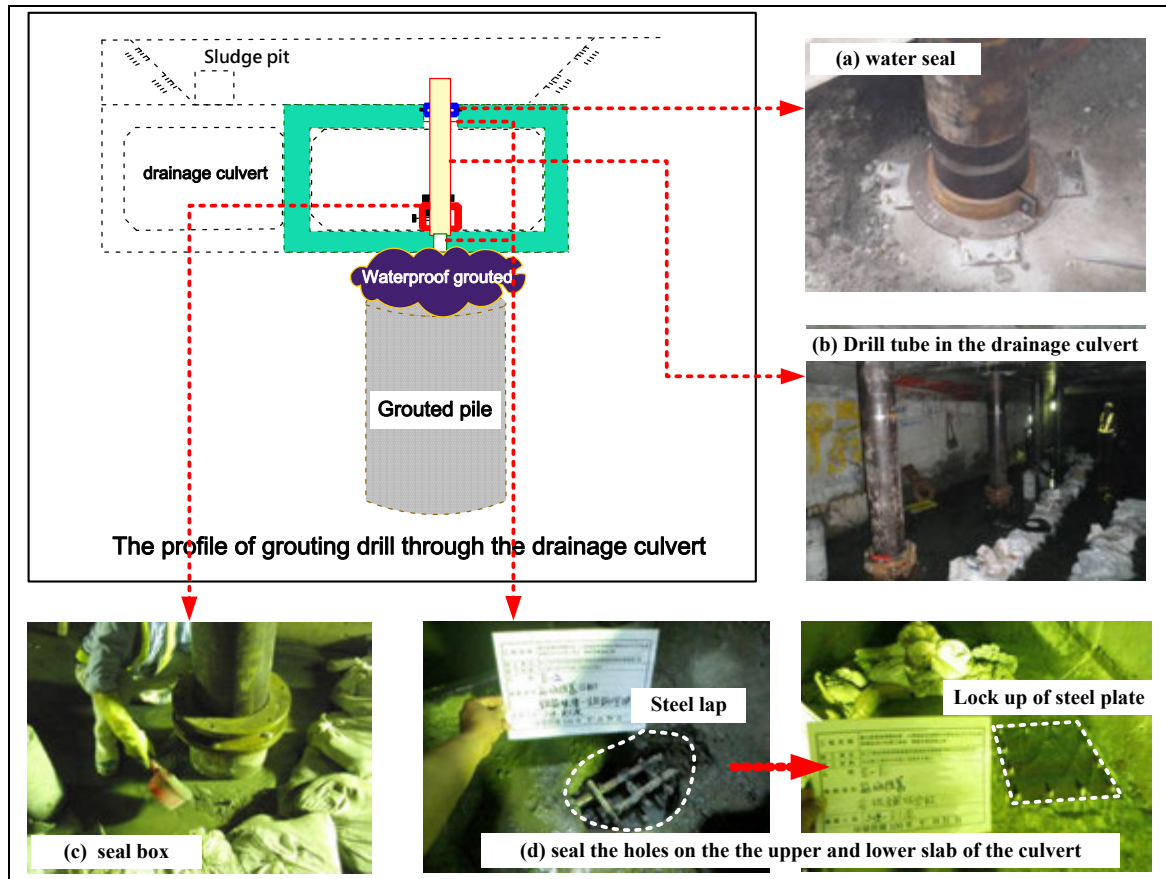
Photos of treatment condition during jet grouting under drainage culvert
